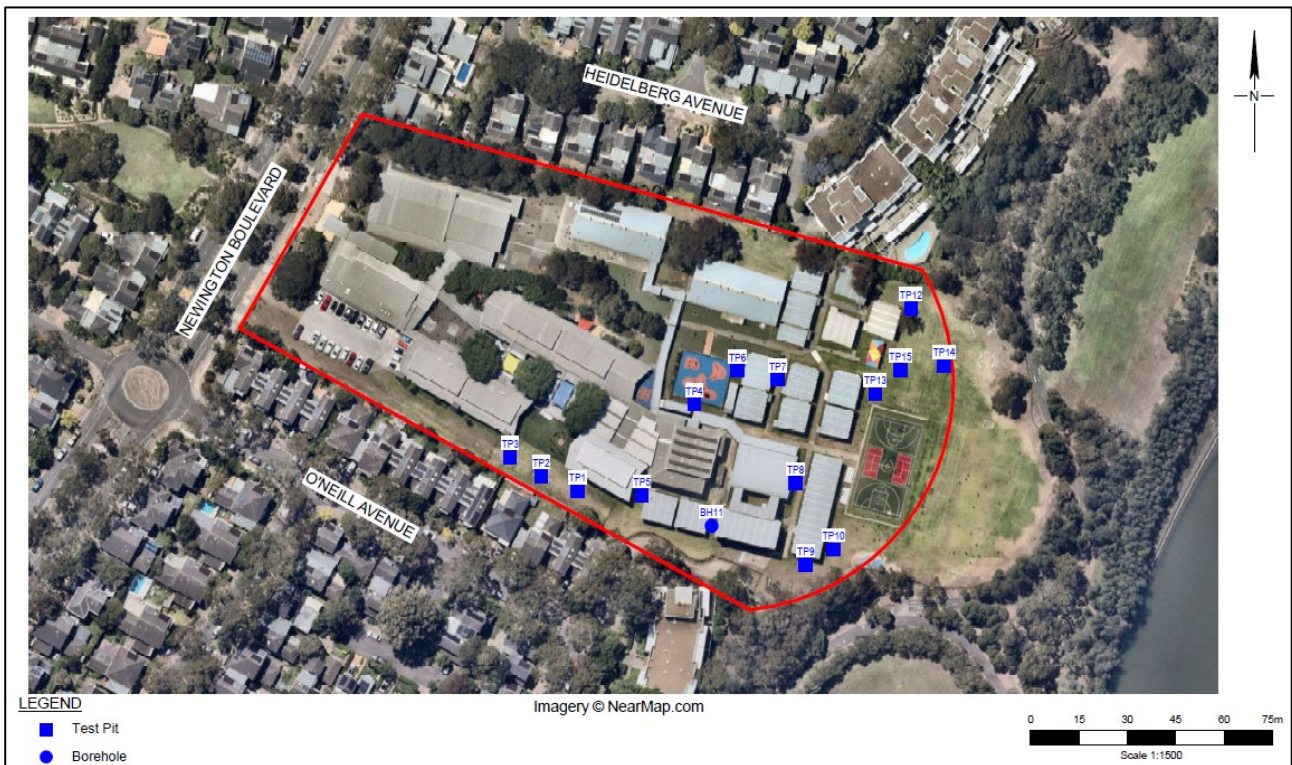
Extract of the borehole and test pit location plan (Source: Stantec)
